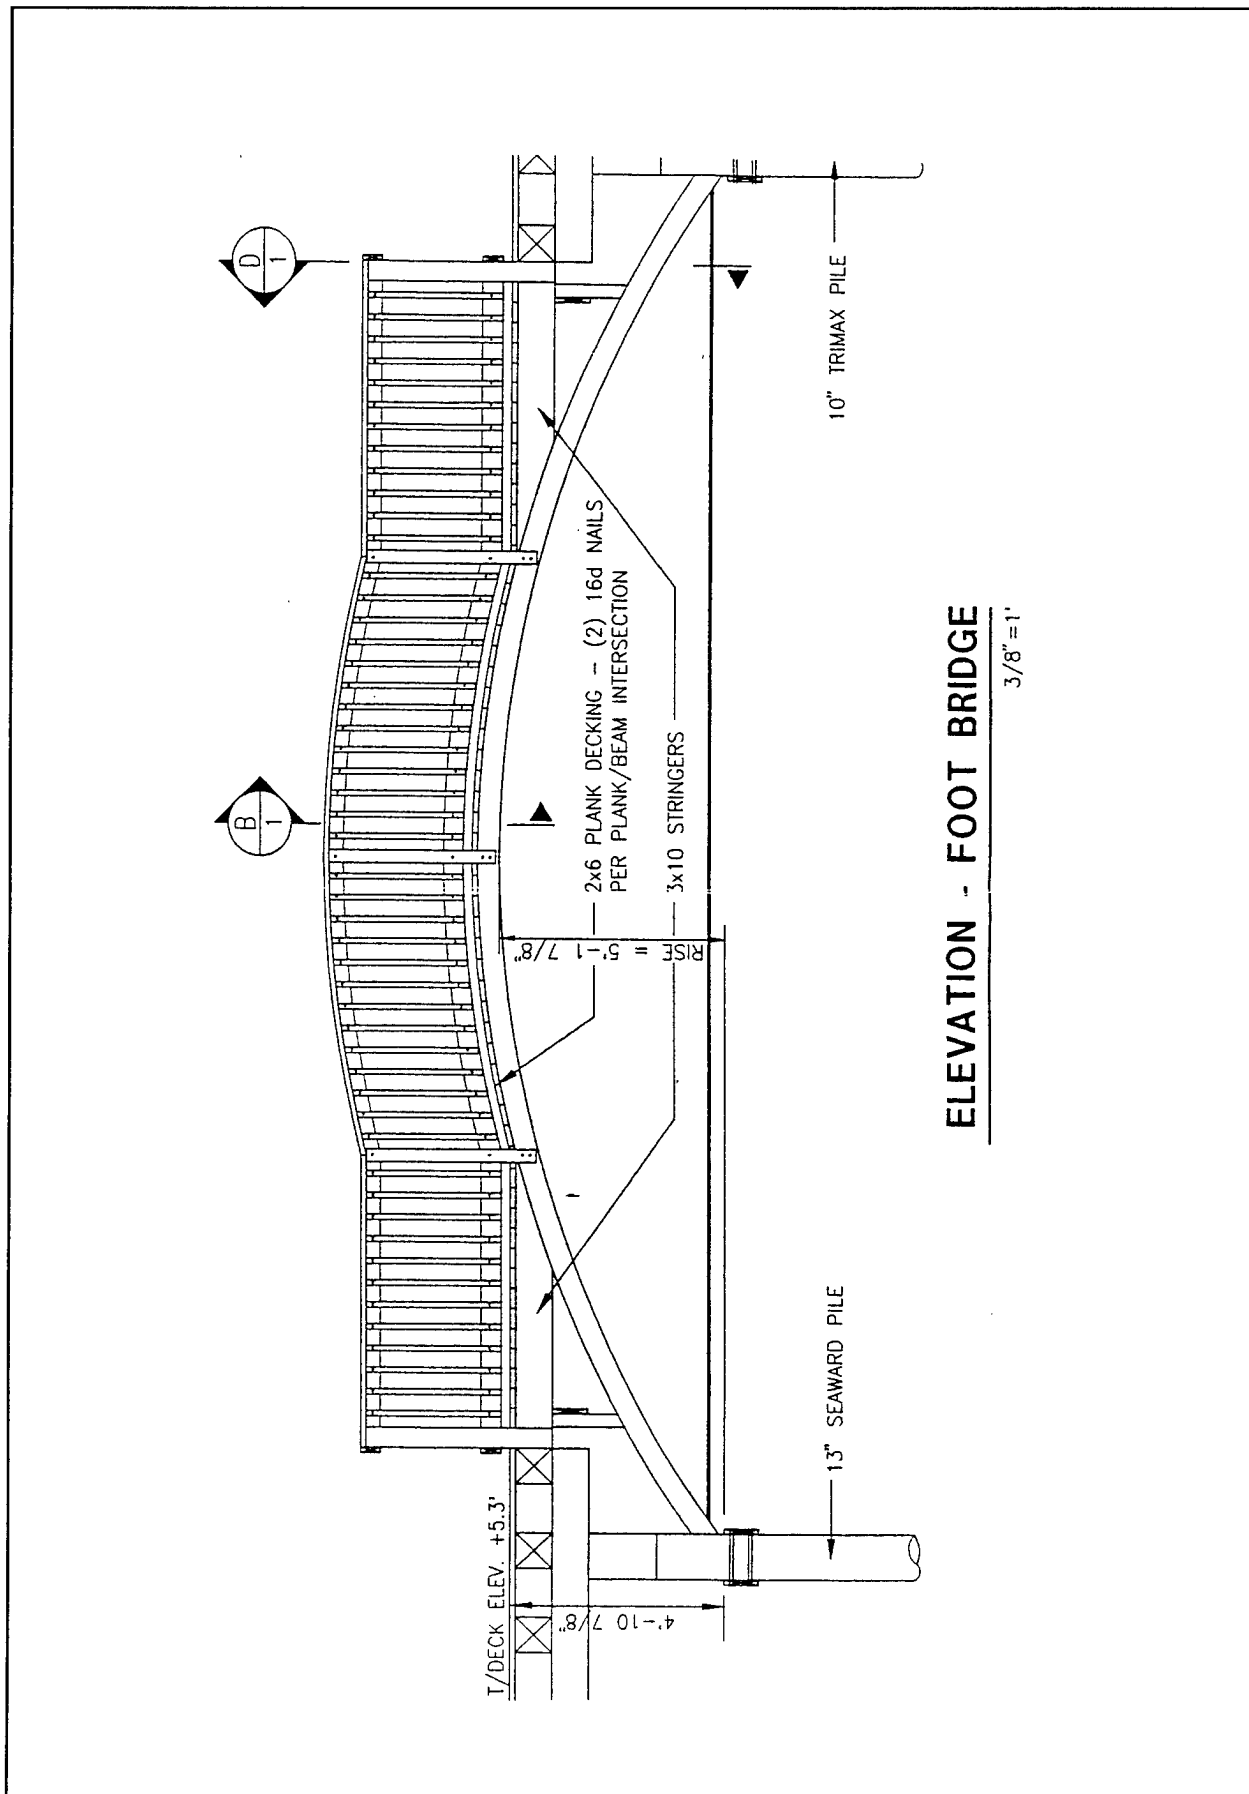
Schematic drawing of proposed arch bridge to be installed at the Tiffany Street Pier.
